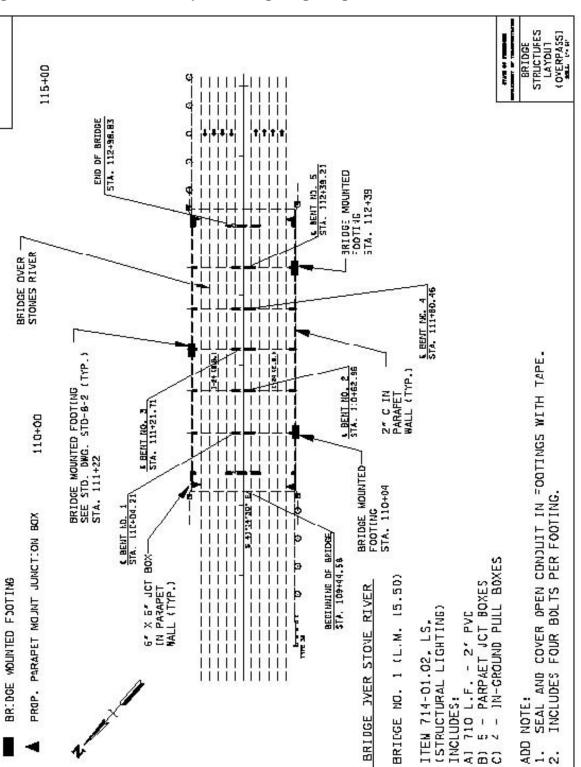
Detail of Overpass Bridge Lighting for Submittal to Structures
